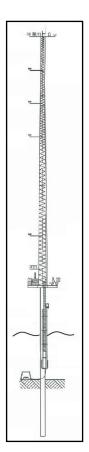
Lattice-type Mast-mounted Meteorological Tower on a Steel Jacket Foundation
